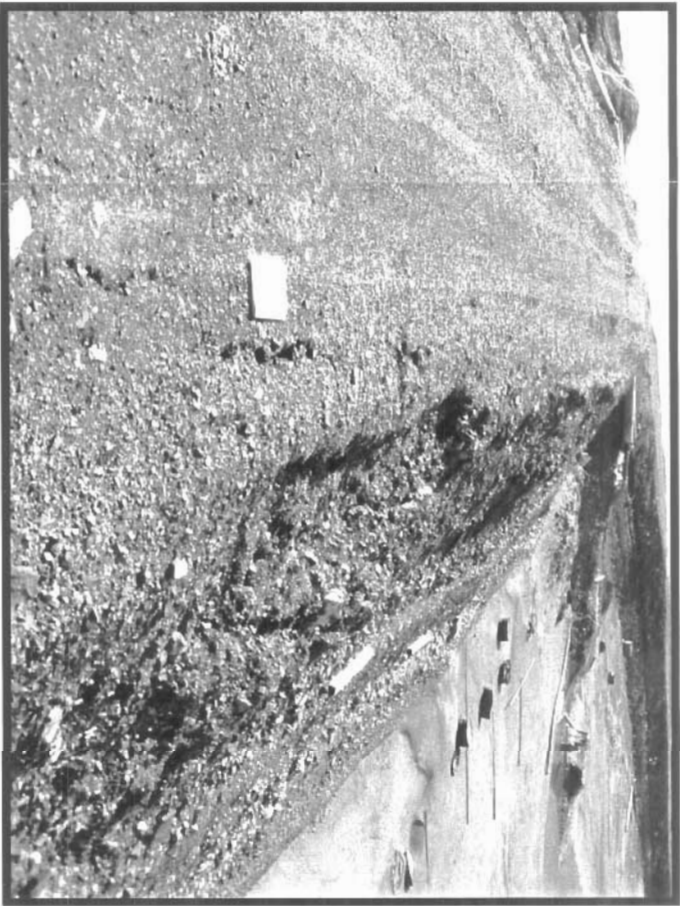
shows some cracking along the crest in the area where the sloughing is occurring on the Test Cell side of the dike.
